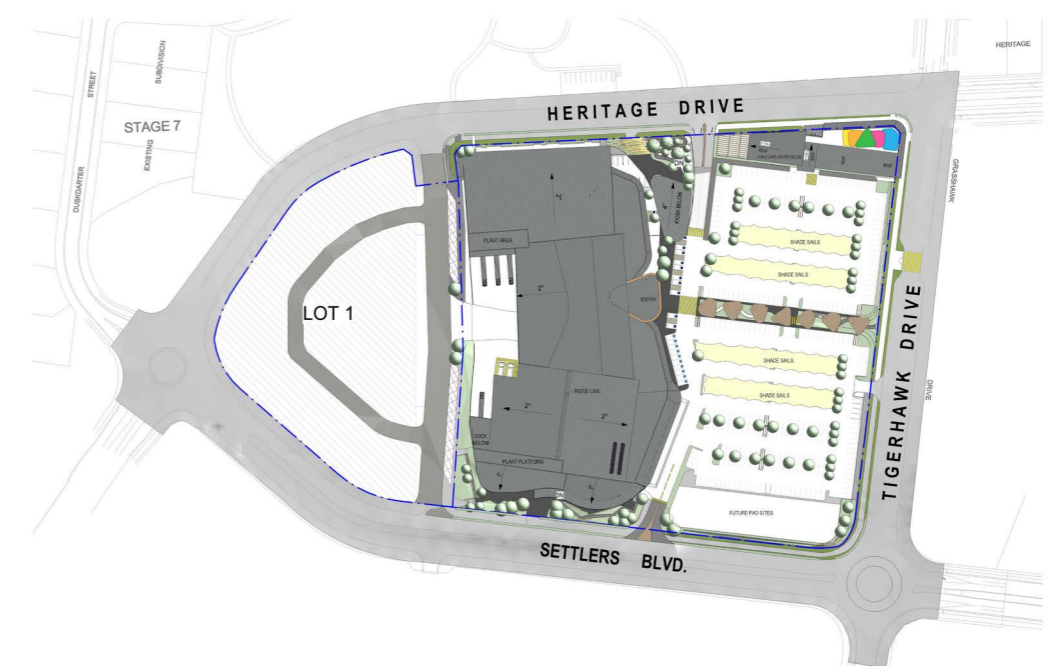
Site Plan showing the shopping centre, its carpark and road network. (BN Group 2021)
